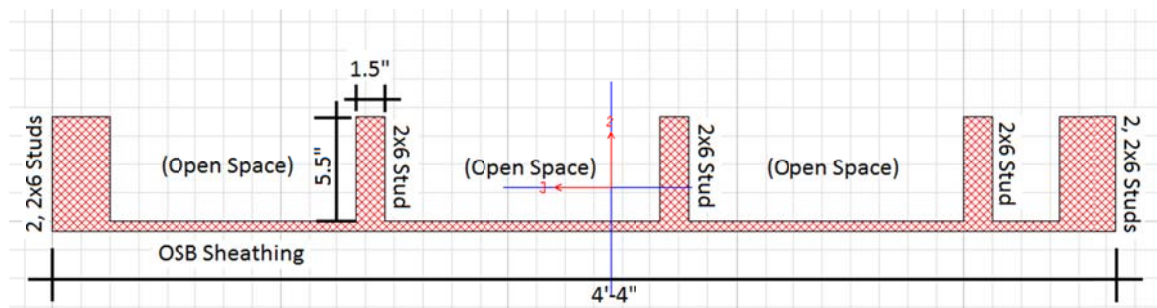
Wall 2 cross-section draw in 'Section Designer'
